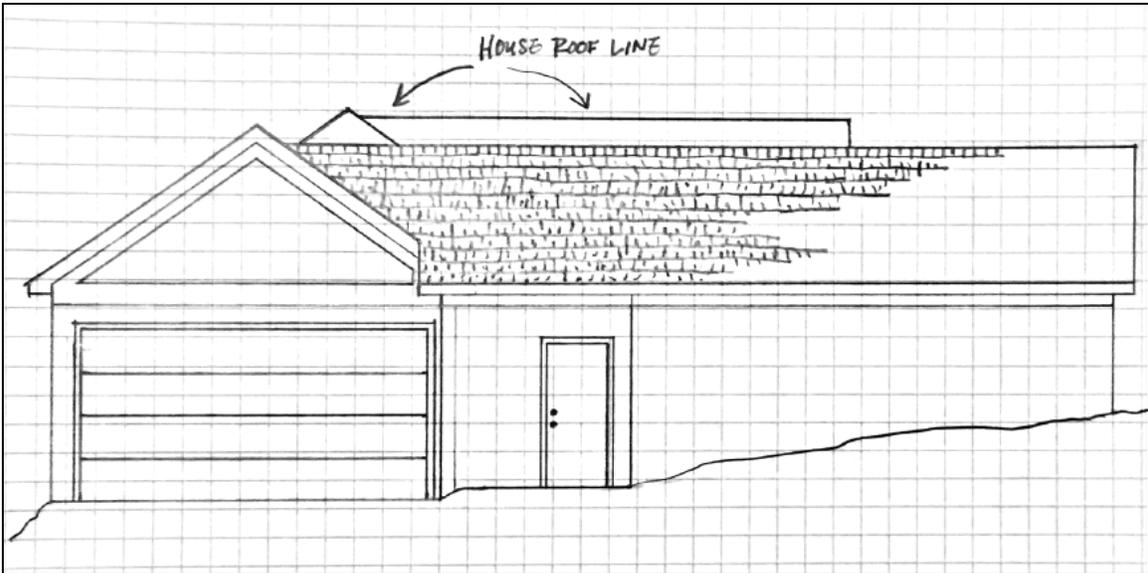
Proposed gabled roof. Roof peak of main house, beyond.
